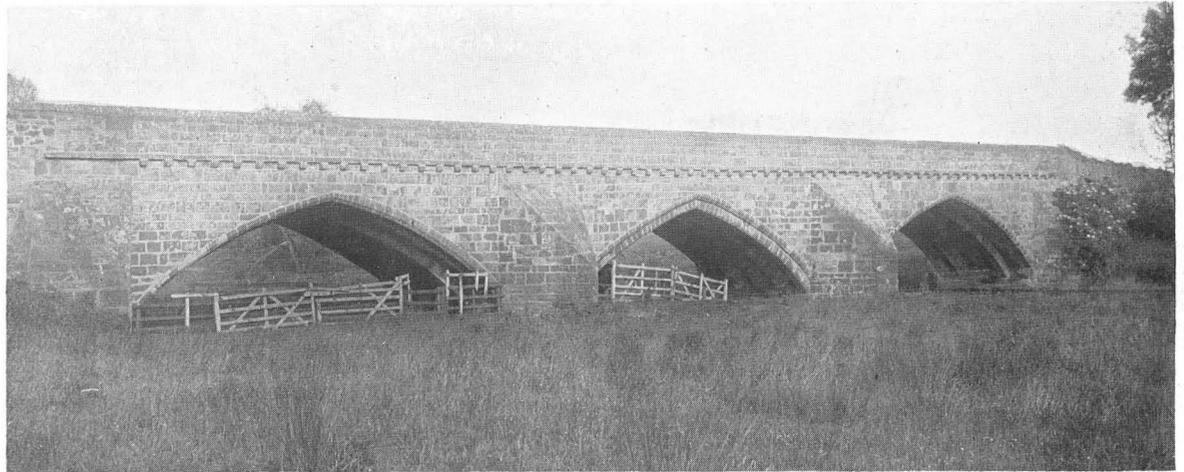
Abbey Bridge, Haddington (No. 76).
